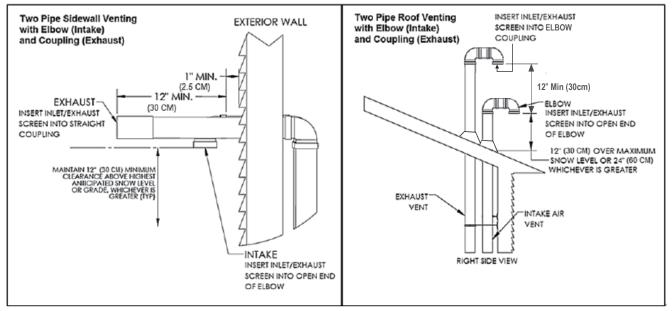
Direct Vent, Roof and Sidewall Vent Terminations
